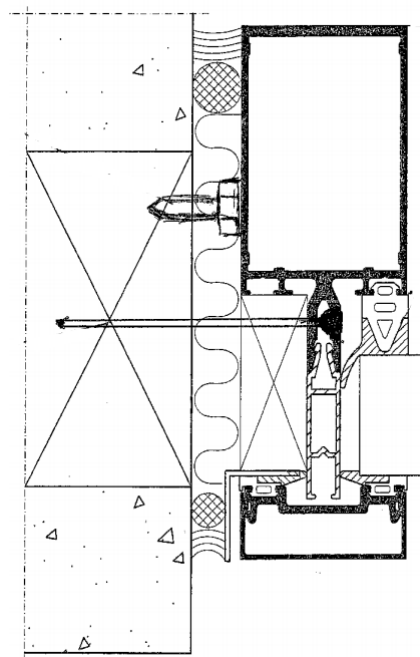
Direct connection to wall via screw. Image provided by Purso Oy.
